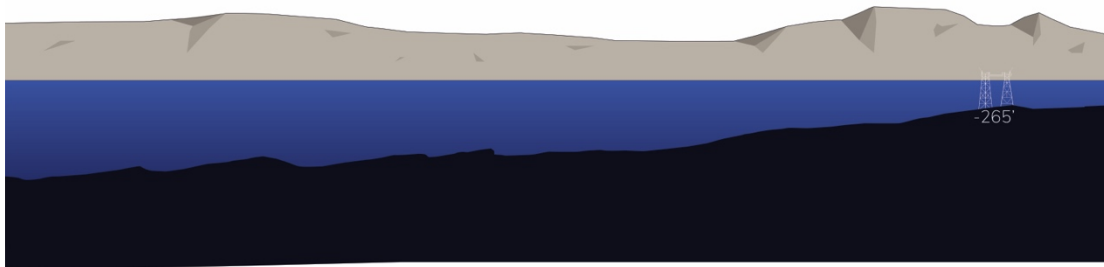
This site section shows the depth at which Elly and Ellen are located as well as the steep bathymetry. (Source: author)
